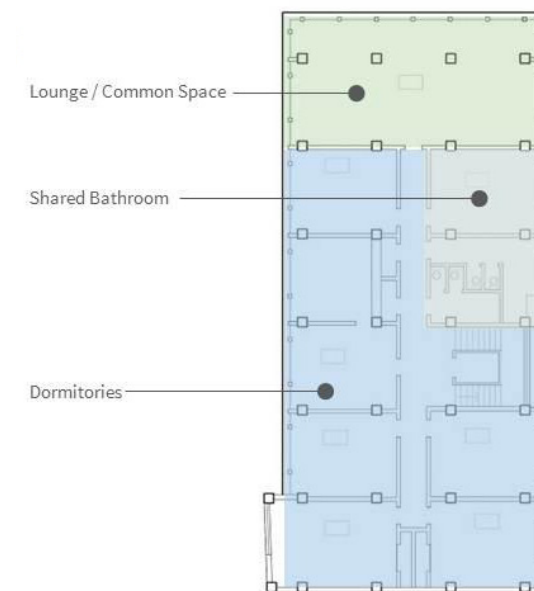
Proposed ground Floor Plan for Teatro Atahualpa and Edificio Bolivar
